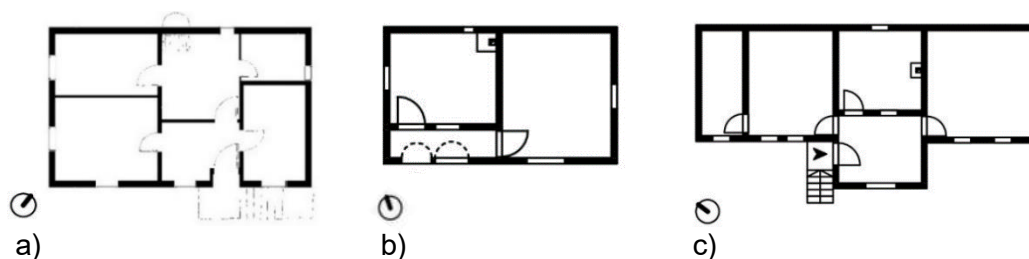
Ground-floor plans of the houses with single above-ground level: a) rectangular house with semi underground level in Stakevtsi b) two-room house in Senokos; c) T-shape house in Senokos, sources: A. Karapandzheva and B. Rančev
